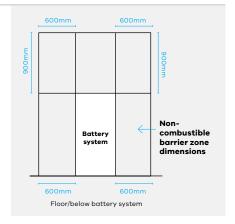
In this example a compliant non-combustible barrier made out of compressed cement sheeting has been
